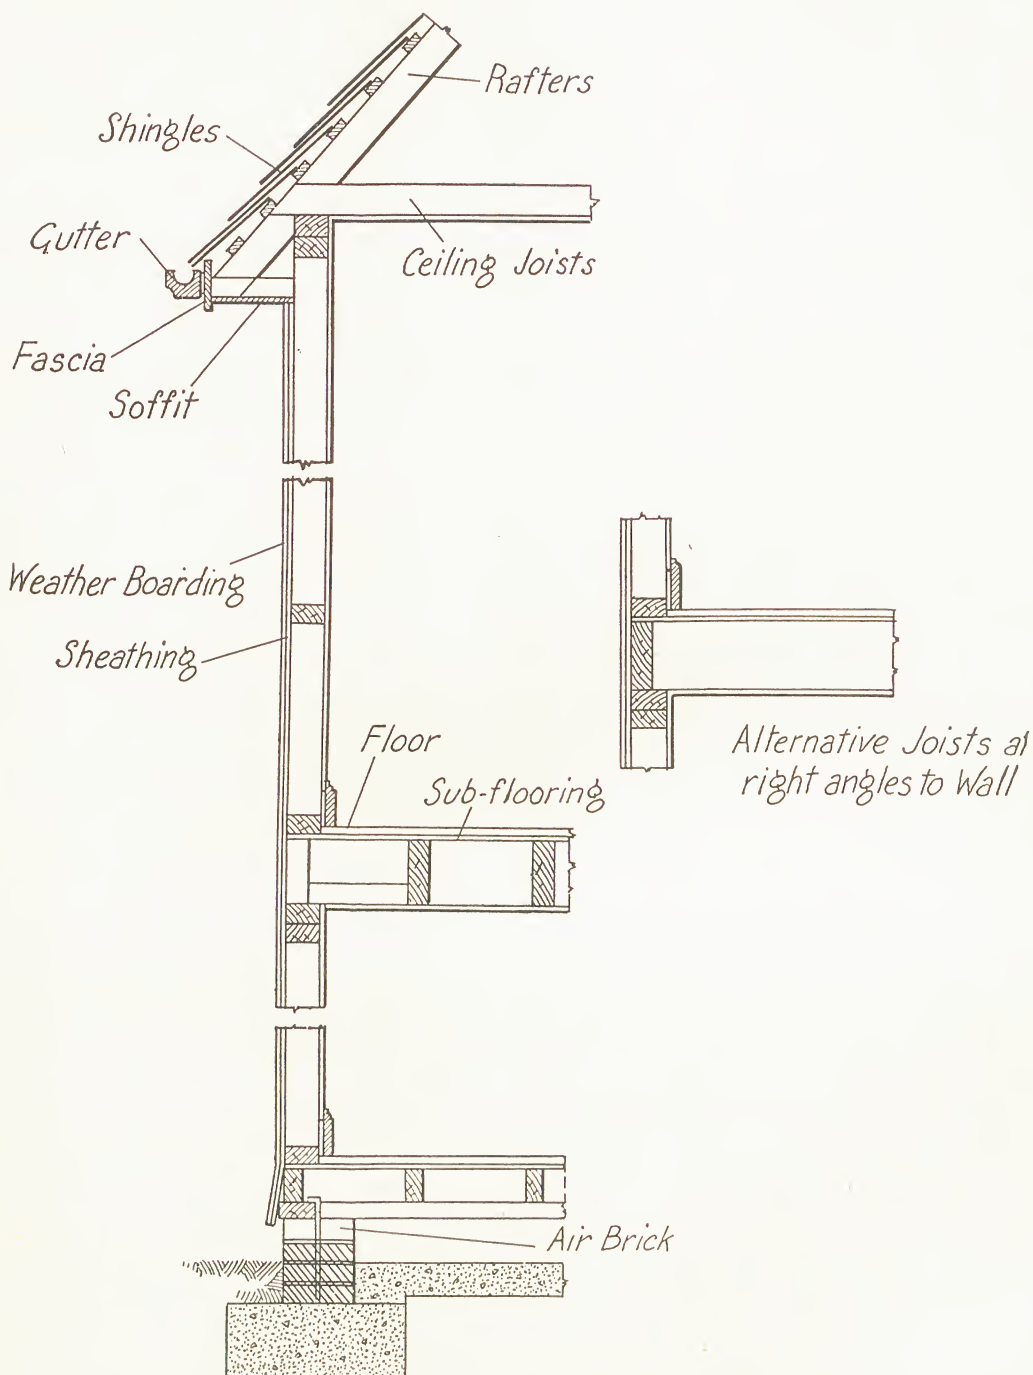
Platform frame construction. The floors form platforms on which wall frames are erected.
